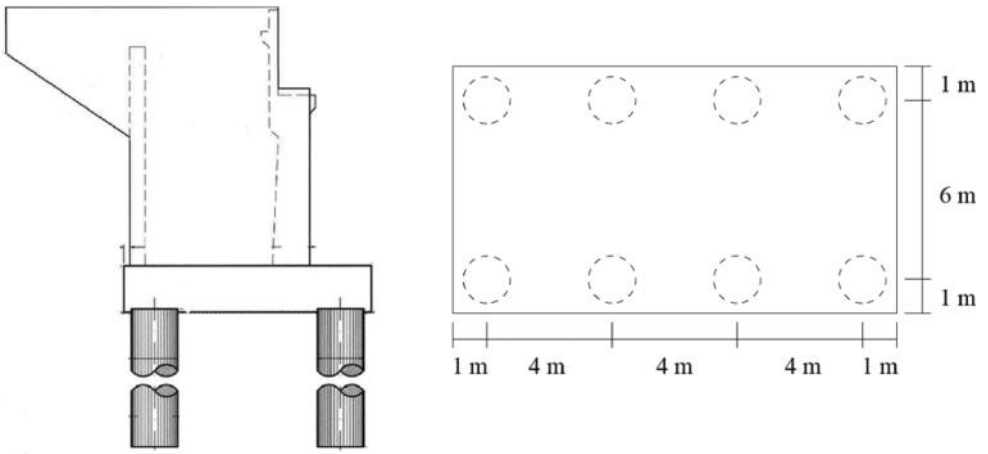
Layout of Mataquito bridge foundation (courtesy Ministerio de Obras Públicas, Chile).
